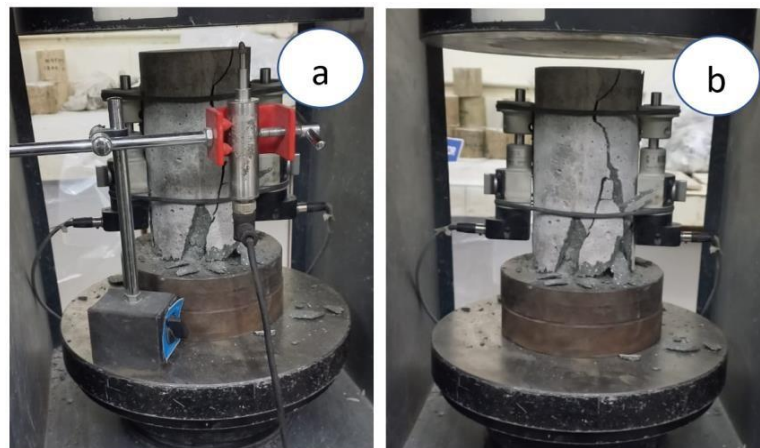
The failure mode of the tested concrete specimen (a.) View 1, (b.) View 2
